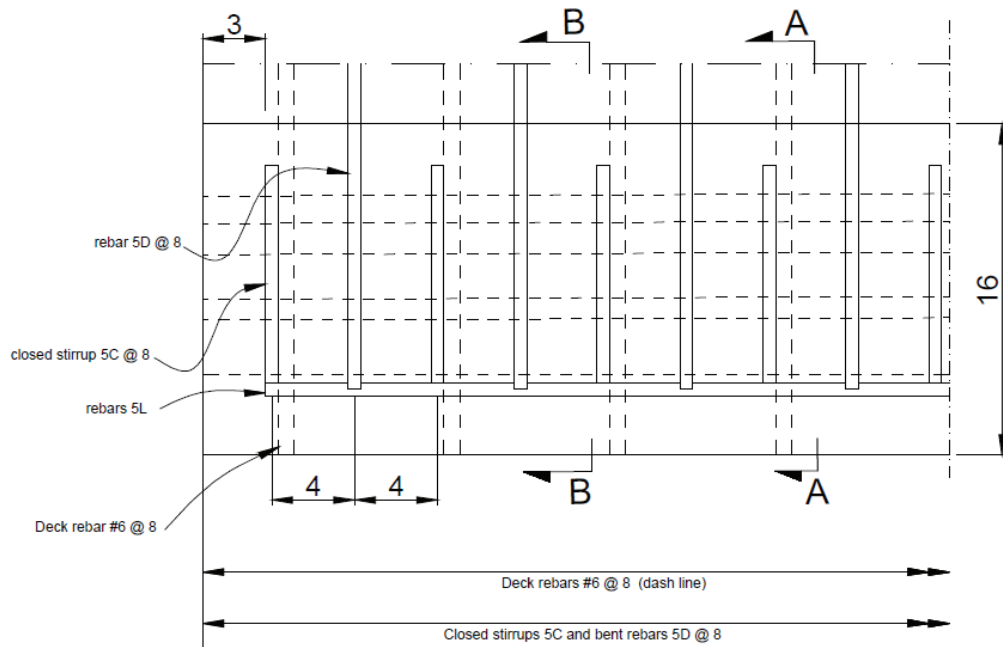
Plan View pendulum specimen single slope 36" all measurements in inches
